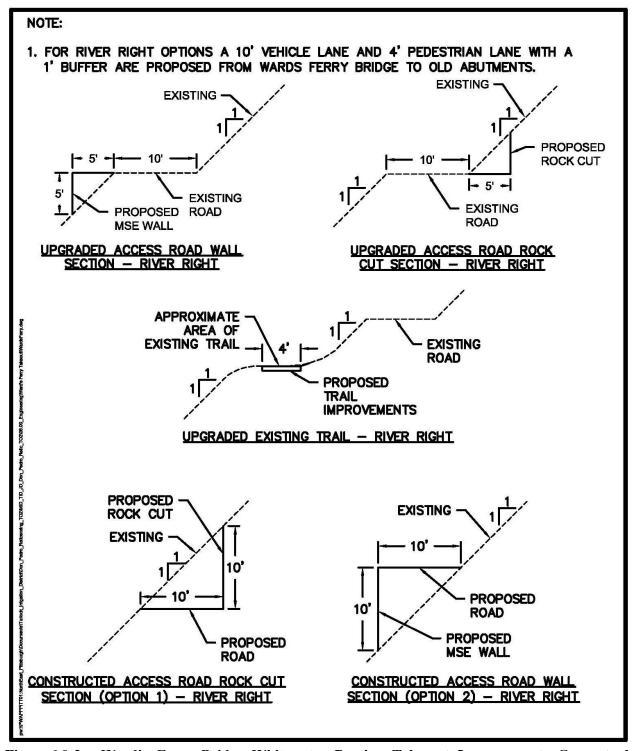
Ward's Ferry Bridge Whitewater Boating Take-out Improvements Conceptual Design, River Right Options - Typical Sections.
